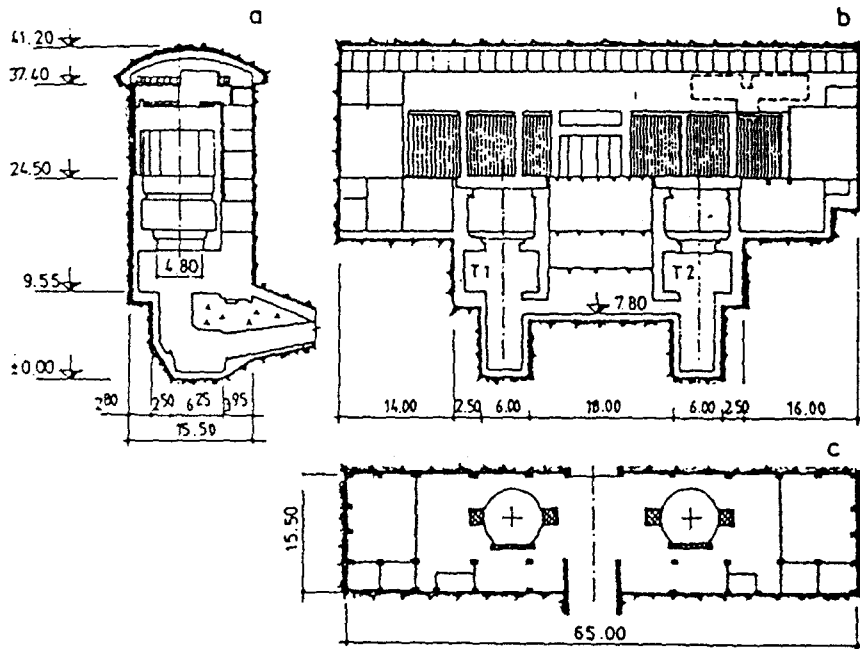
Riuł-Mare Retezat hydropower house : a-cross section, b-longitudinal section, c-horizontal section at the generator hall level.(After A.Popovici et al.)
